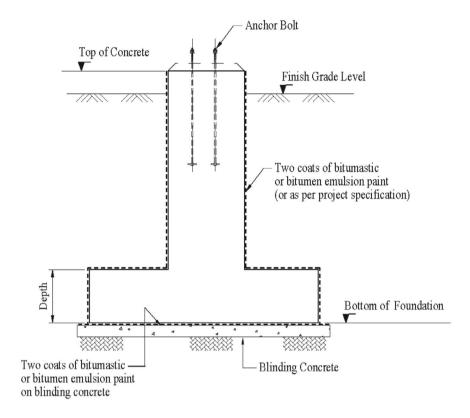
Protection of Foundation from Subsoil corrosion
